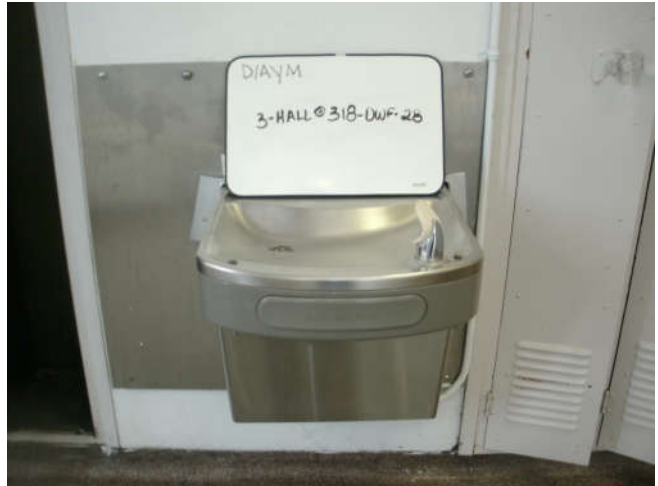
Drinking water fountain, located in a 3rd floor hall, left of room 318.
